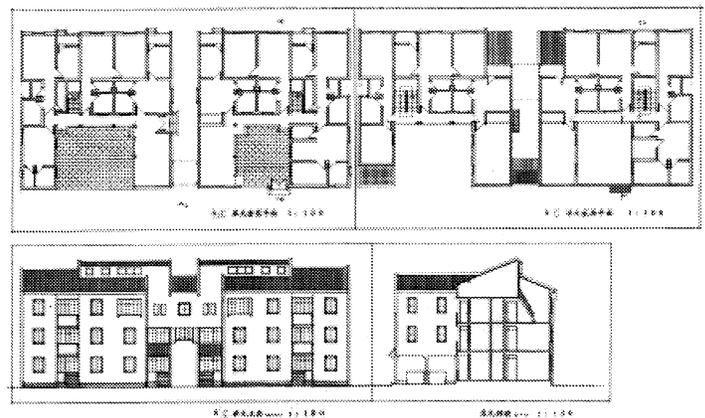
Plans, section and elevation of type one new houses. (Clockwise from top left: first floor plan, second floor plan, section and elevation.)
